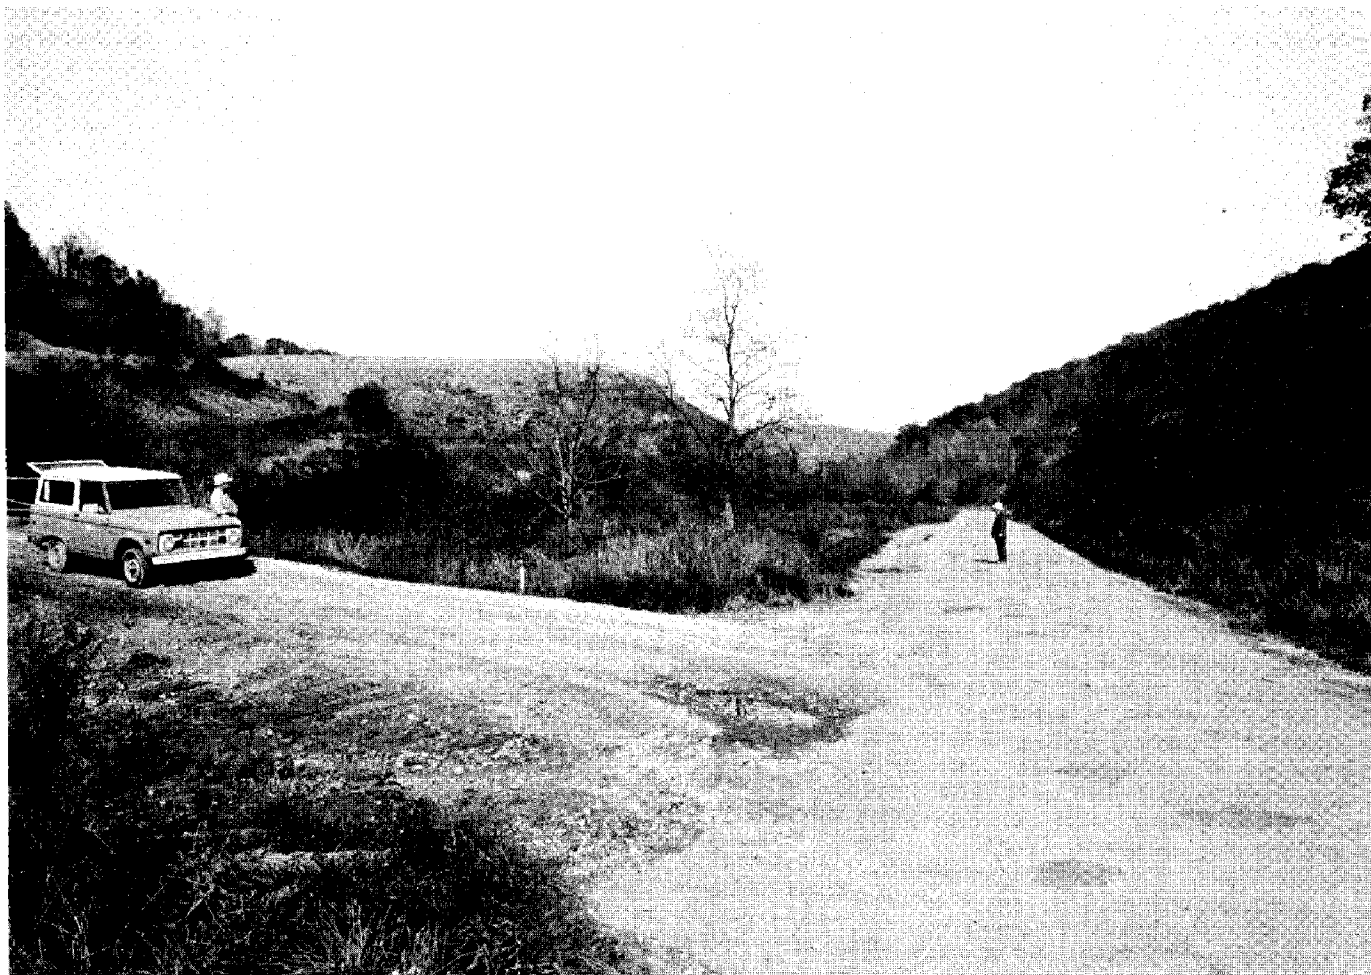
Joanne Mine Reclamation Site. Face of 50-foot refuse bank planted with trees (on the extreme right).
